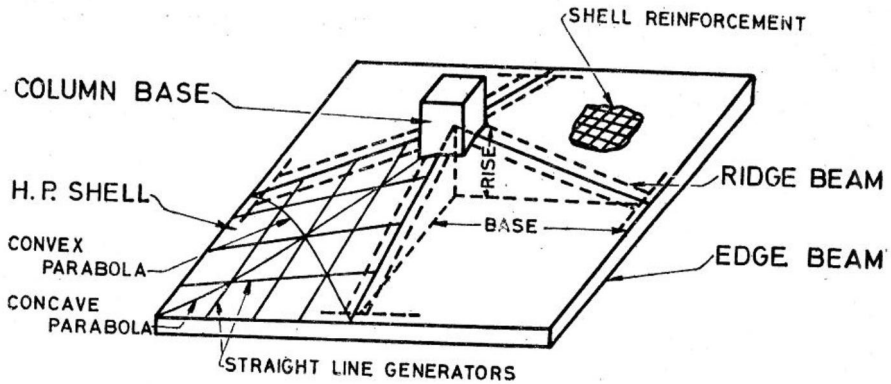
Reinforced concrete individual hyperpar footing.
